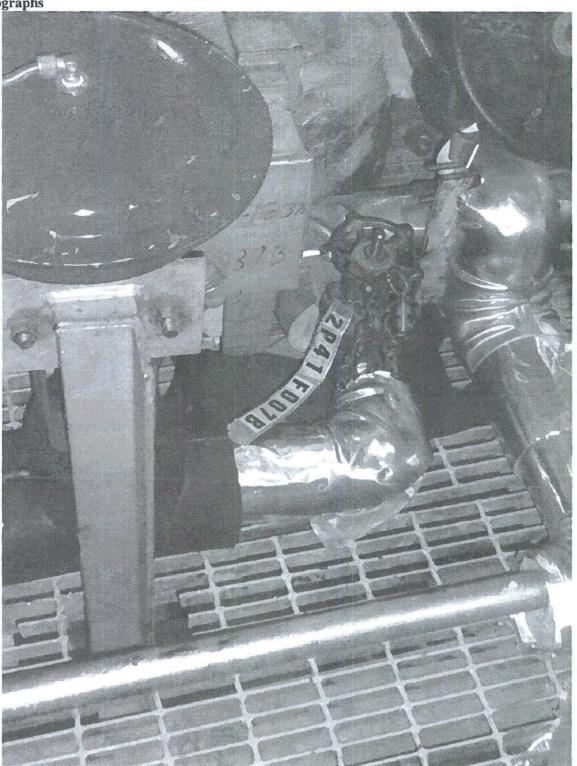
Loose Pipe Insulation (SE Diagonal Unit 2)
